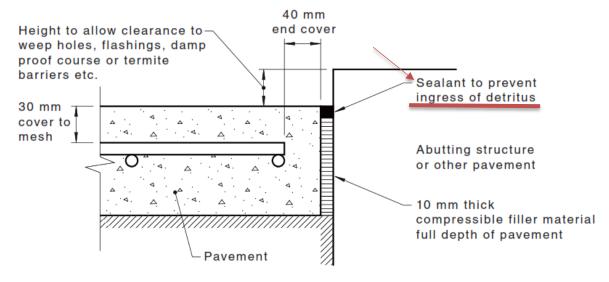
TYPICAL ISOLATION JOINT
